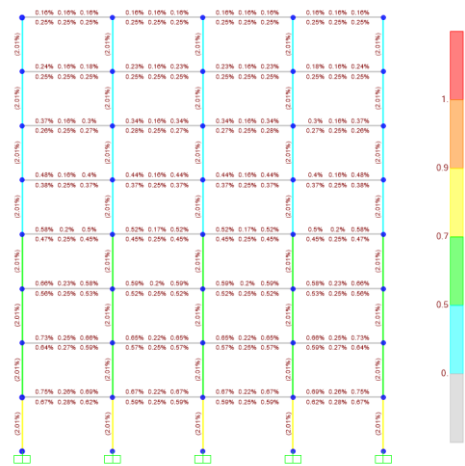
Structure's columns & beams max. percentage of longitudinal reinforcement (axis-2) in zone IV
